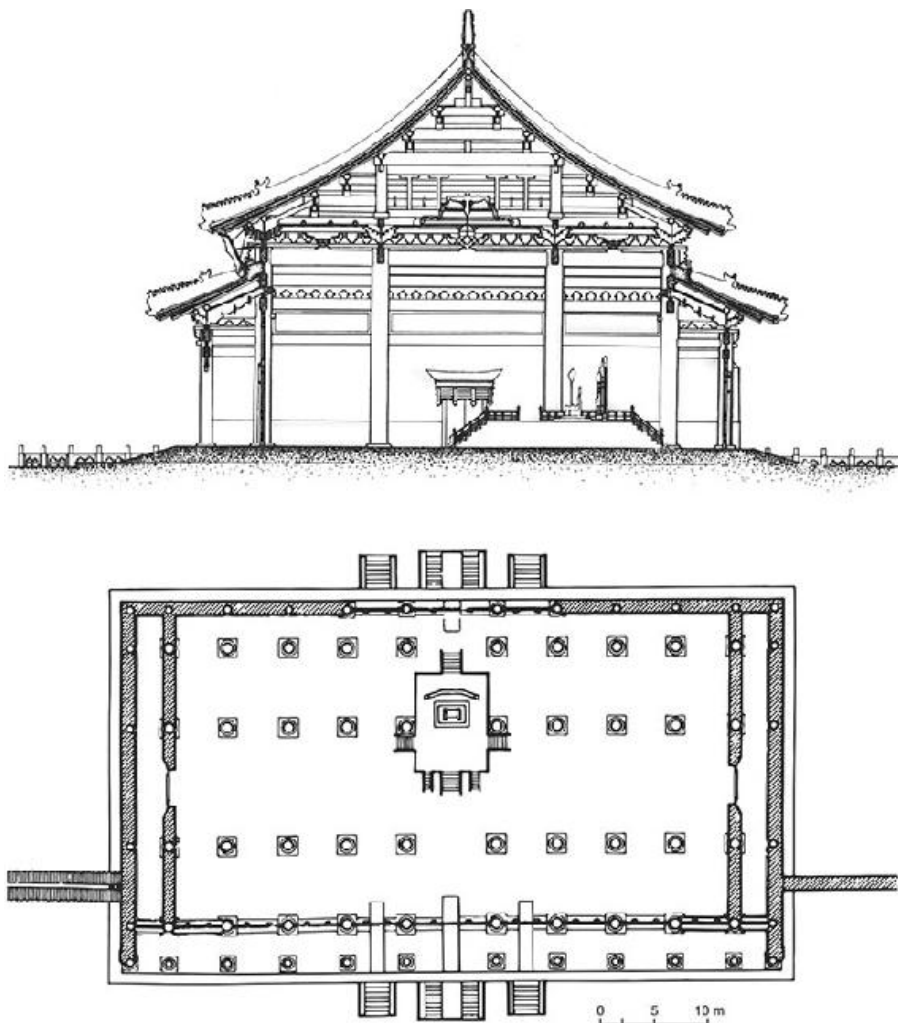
and b Hall of Supreme Harmony section and ground plan, after Liu Dunzhen, *Zhongguo gudai jianzhu shi*, Beijing: Zhongguo jianzhu gongye chubanshi, 2005, 297
